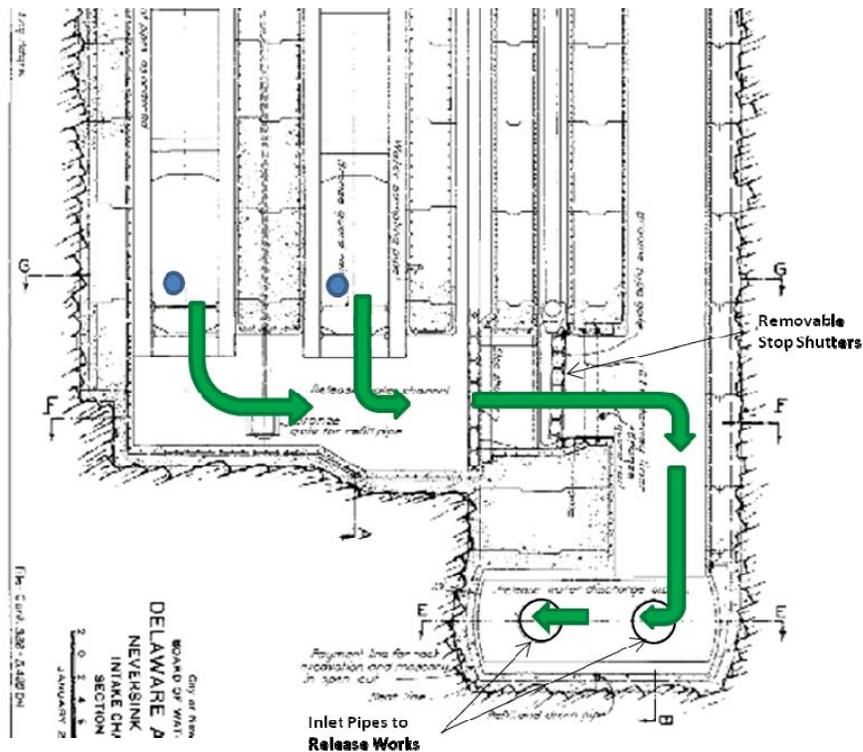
Plan view of Neversink intake troughs.
